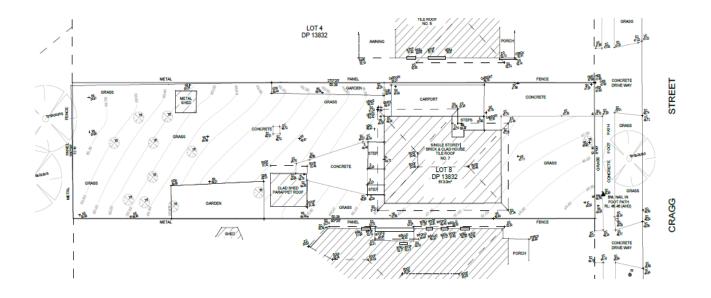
EXISTING SURVEY PLAN OF SUBJECT SITE.
